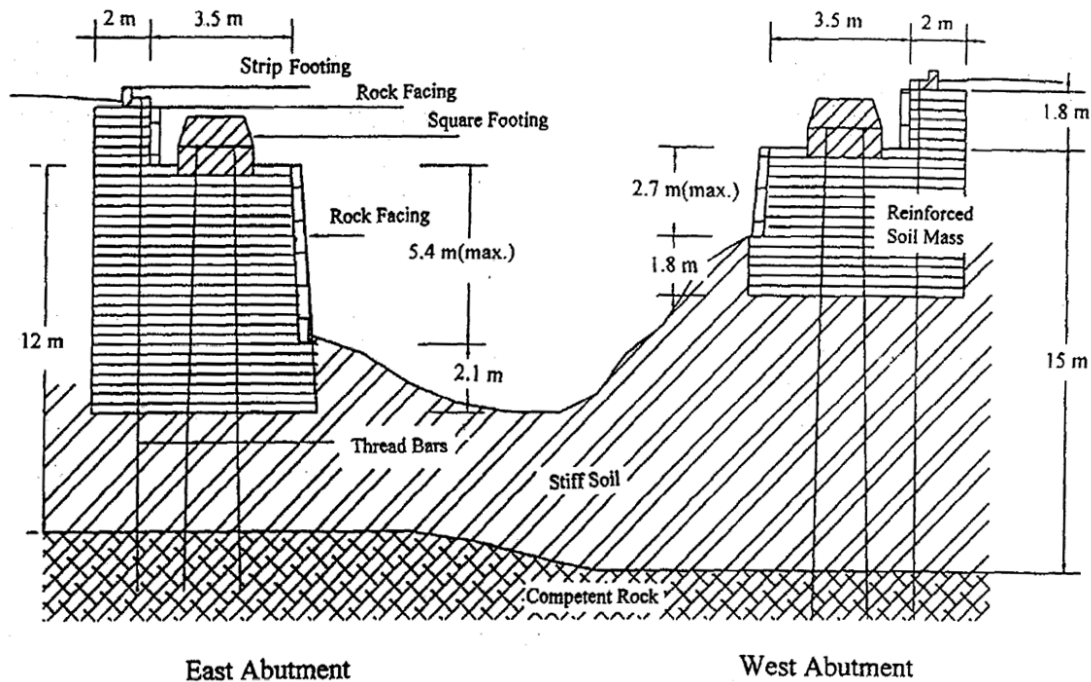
East and West Blackhawk Bridge Abutment Details Wu, J. T. H., Ketchart, K., and Adams, M. (2001). "GRS Bridge Piers and Abutments." *FHWA-RD-00-38*, Federal Highway Administration, McLean, VA. Used under fair use, 2014.
